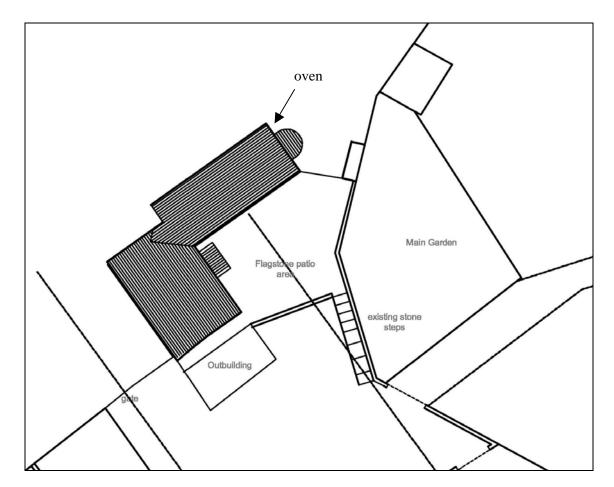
Plan of Tyrywen showing the location of the bread oven
